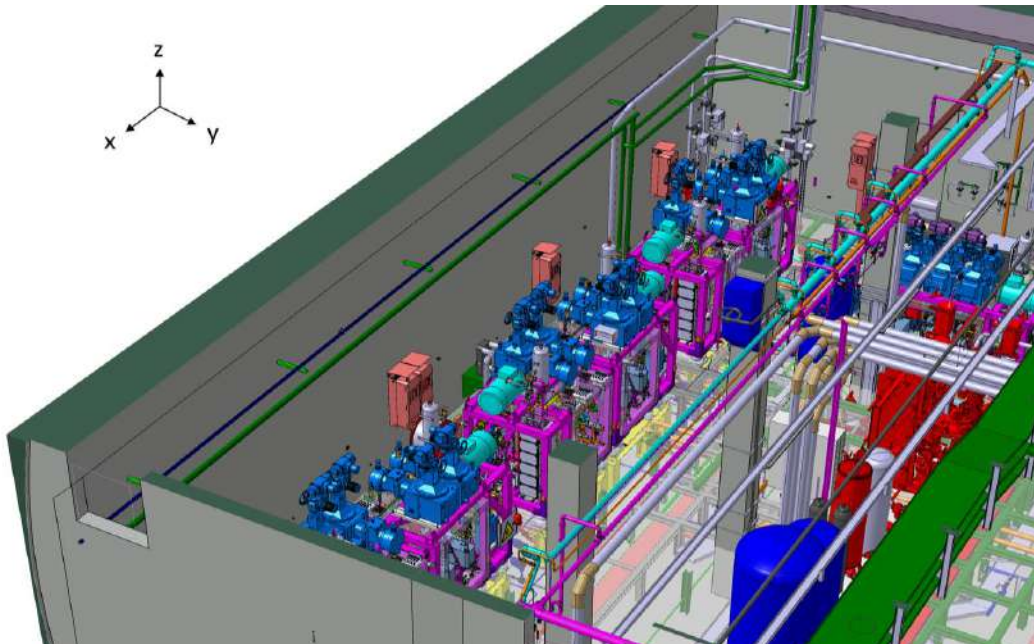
Isometric view of the environment. The crane's railways can extend all the way to the walls ($x-$ and $x+$) and be supported on the wall on the one side ($y-$) and on the pillars on the other side ($y+$)
